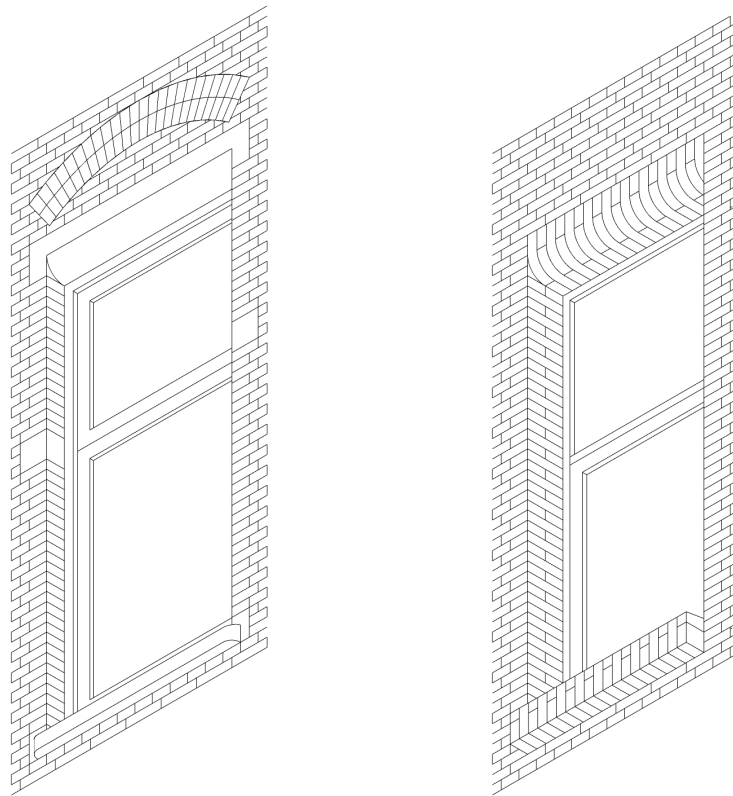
, drawing of first floor windows of the PTT office (left) and Hobbemakade Housing Block (right) (own work)
